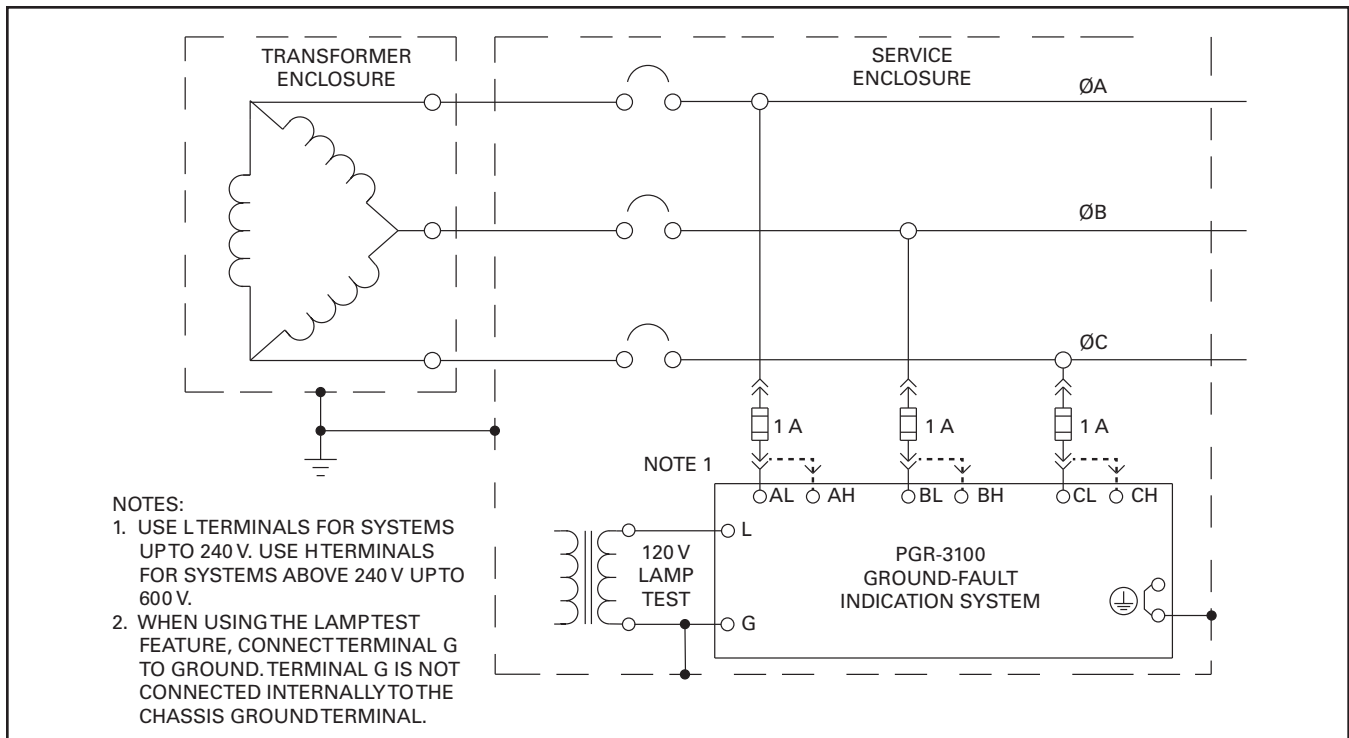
Connection Diagram for an Ungrounded 240- to 600-V System.
